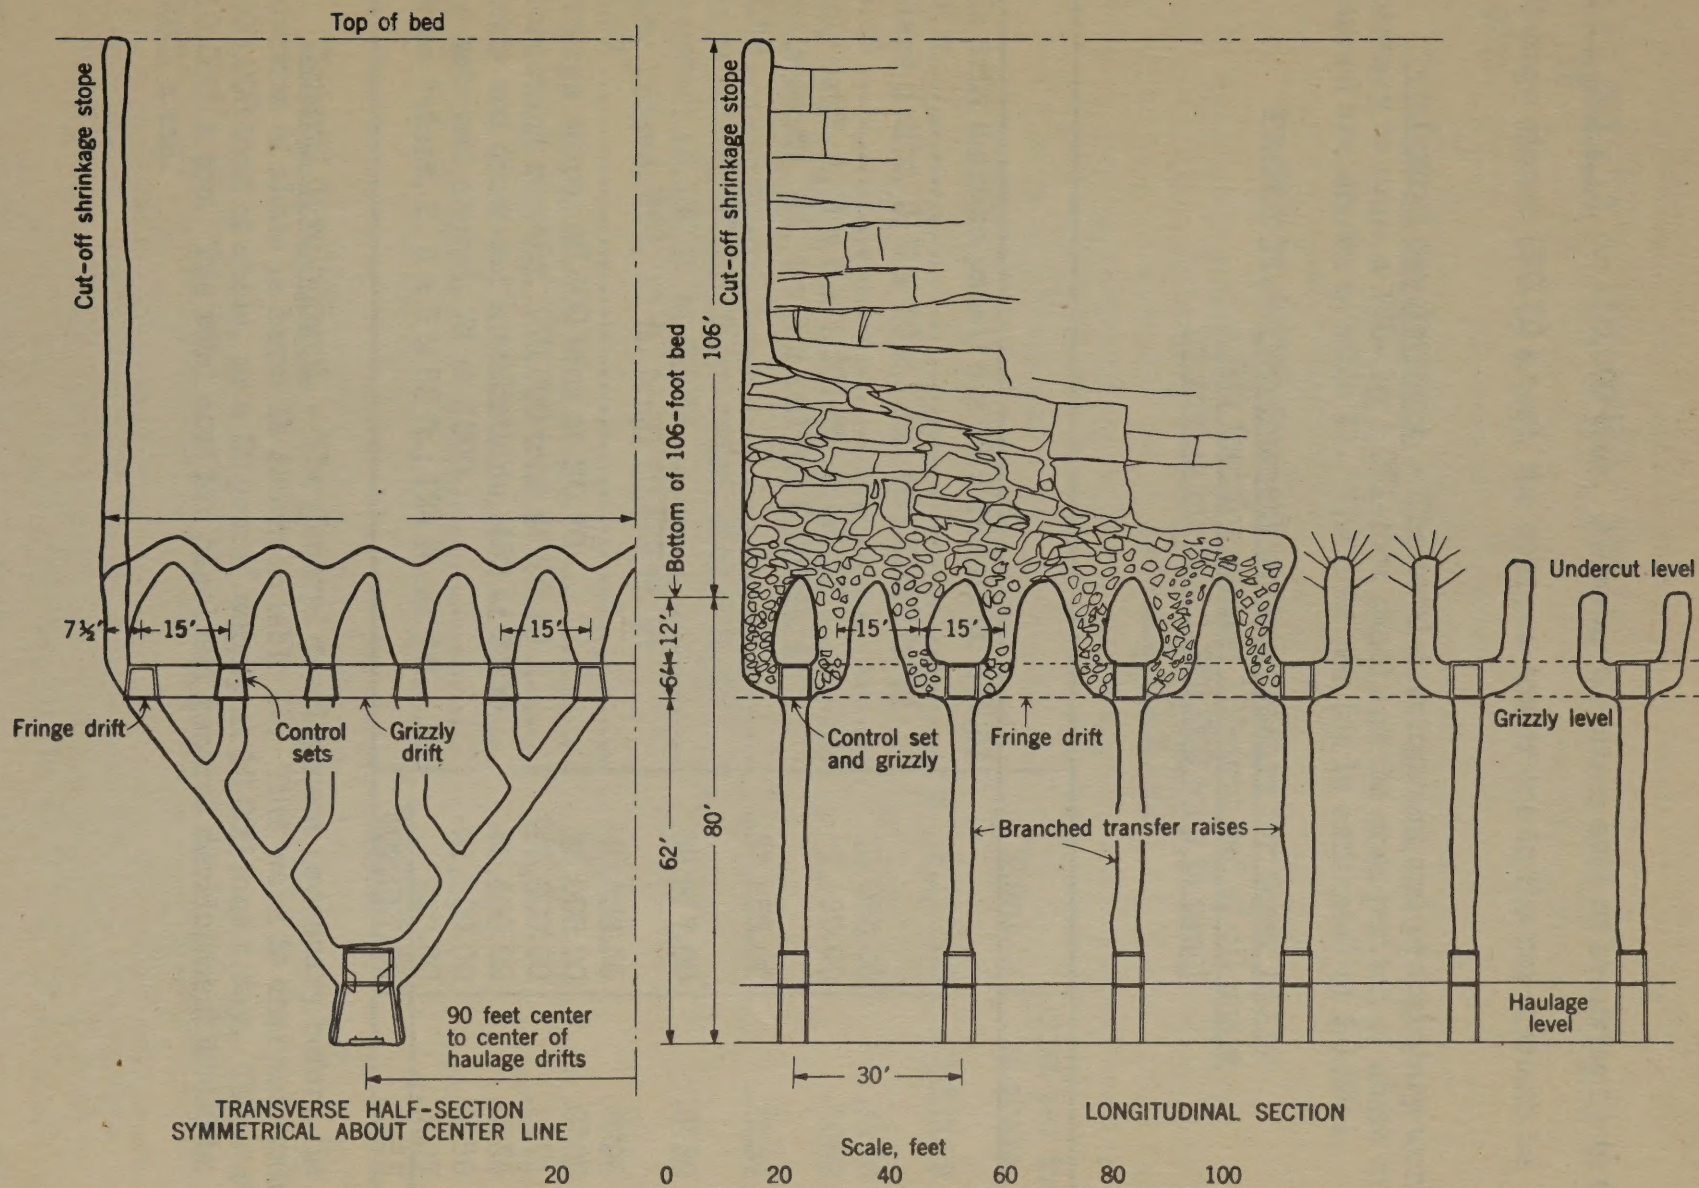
Underground block-caving method for mining 106-foot bed of shale.
